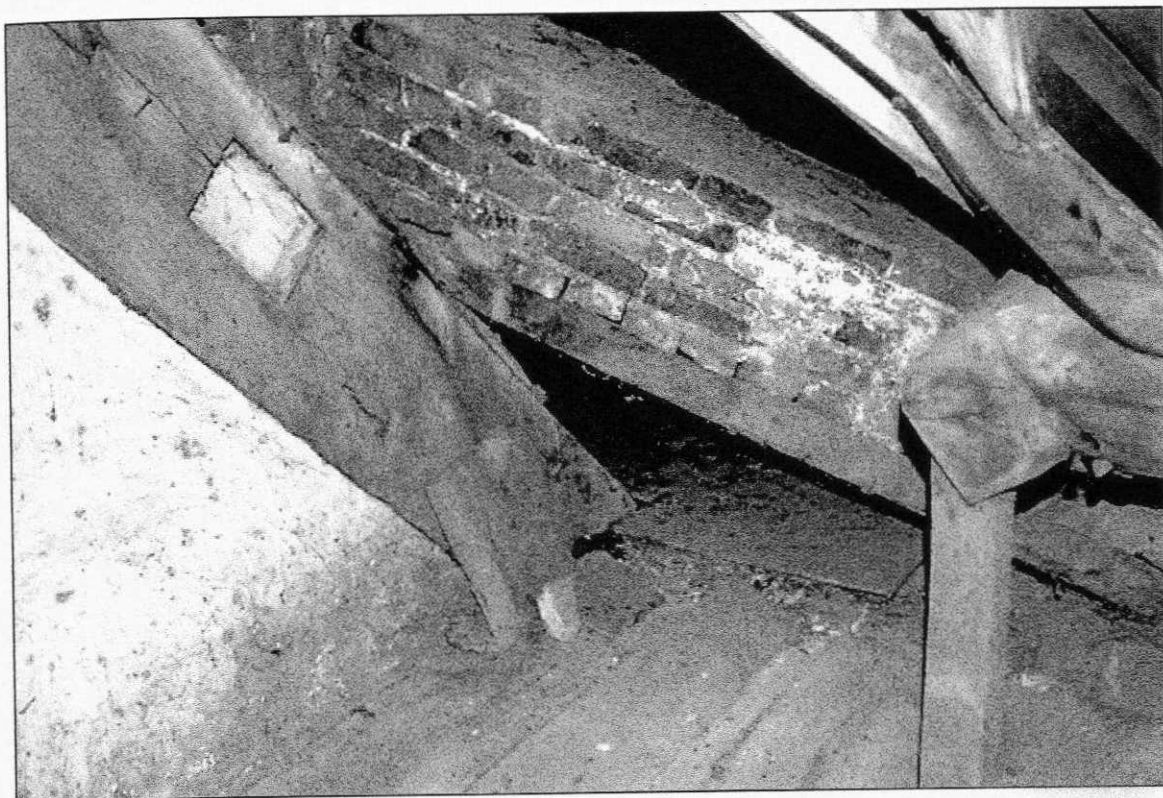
(above): Stub remaining in principal rafter mortice indicates purlin was removed to allow access to bell tower – proving latter is an addition. Also, brick flue from fireplace in breakfast room and chamber above, unusually angled to join flue of kitchen hearth – shows this too was probably added later
